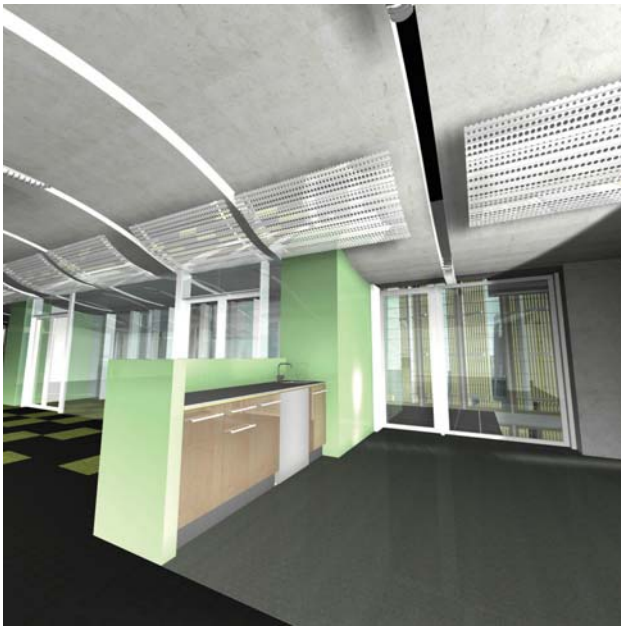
High thermal mass pre-cast concrete ceiling panel (DesignInc).
